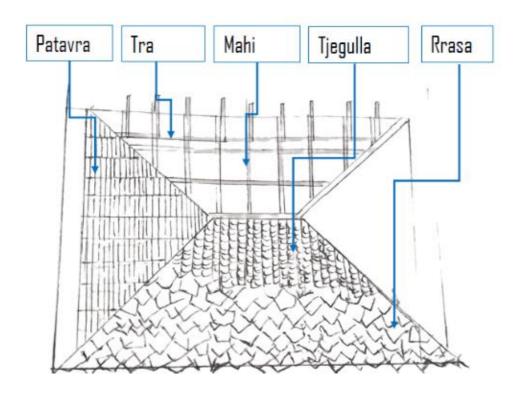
Roof system sketch based on Ali Muka and words collected from people on Shëngjin village.
